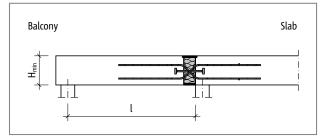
Schöck Isokorb® T type Q-P-VV: Static system
